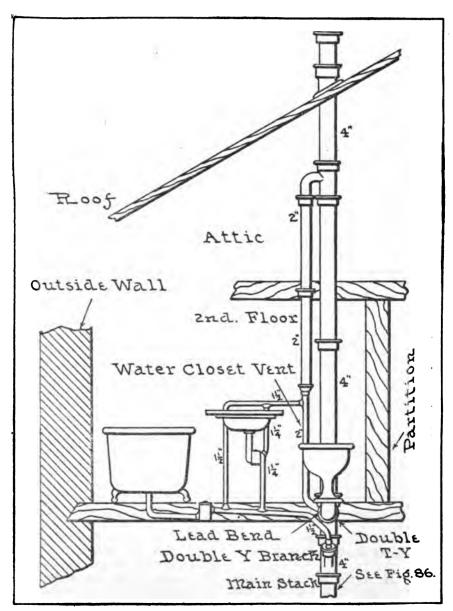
Illustration Showing Elevation of Plumbing in a Bath Room.
